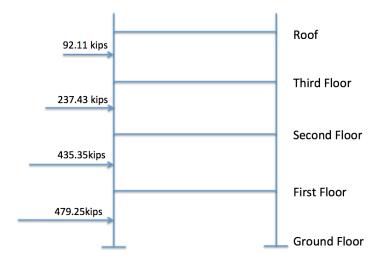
Seismic Forces Acting on Building with Green Roof Technology
